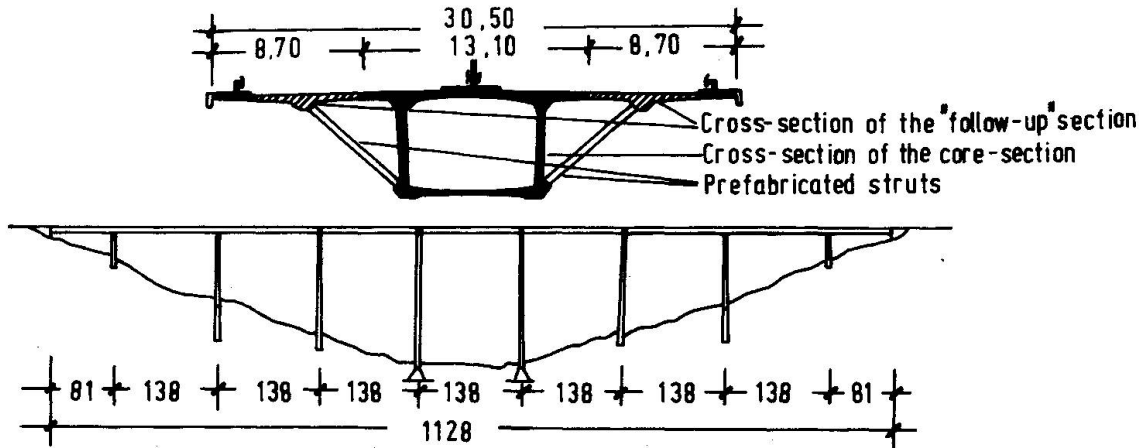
Cross-section and side view of the Kocher Valley Bridge
